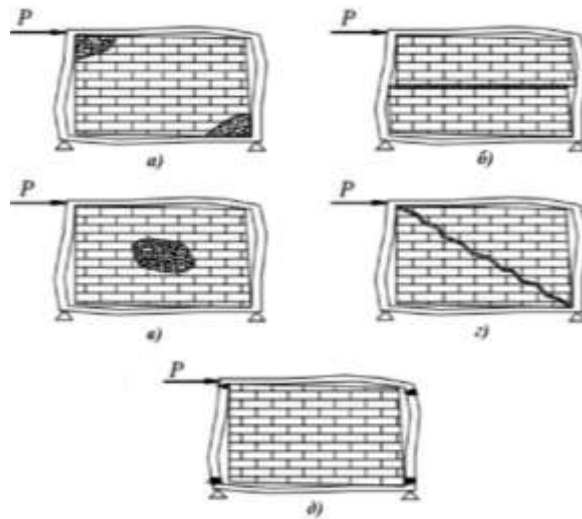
Deformation forms of reinforced concrete frames with brick filler
